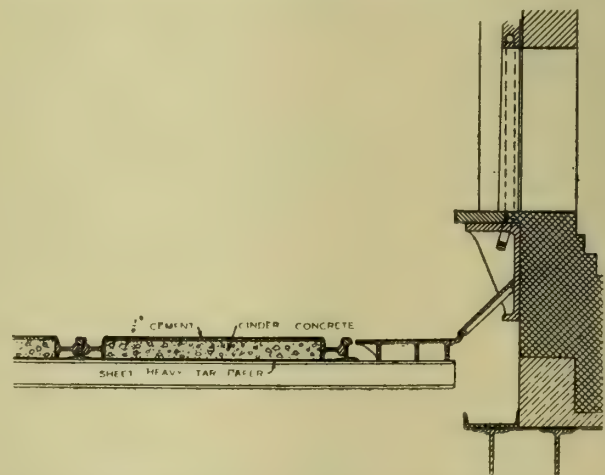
CROSS-SECTION OF CONCRETE FLOOR ON CHARGING PLATFORM.
